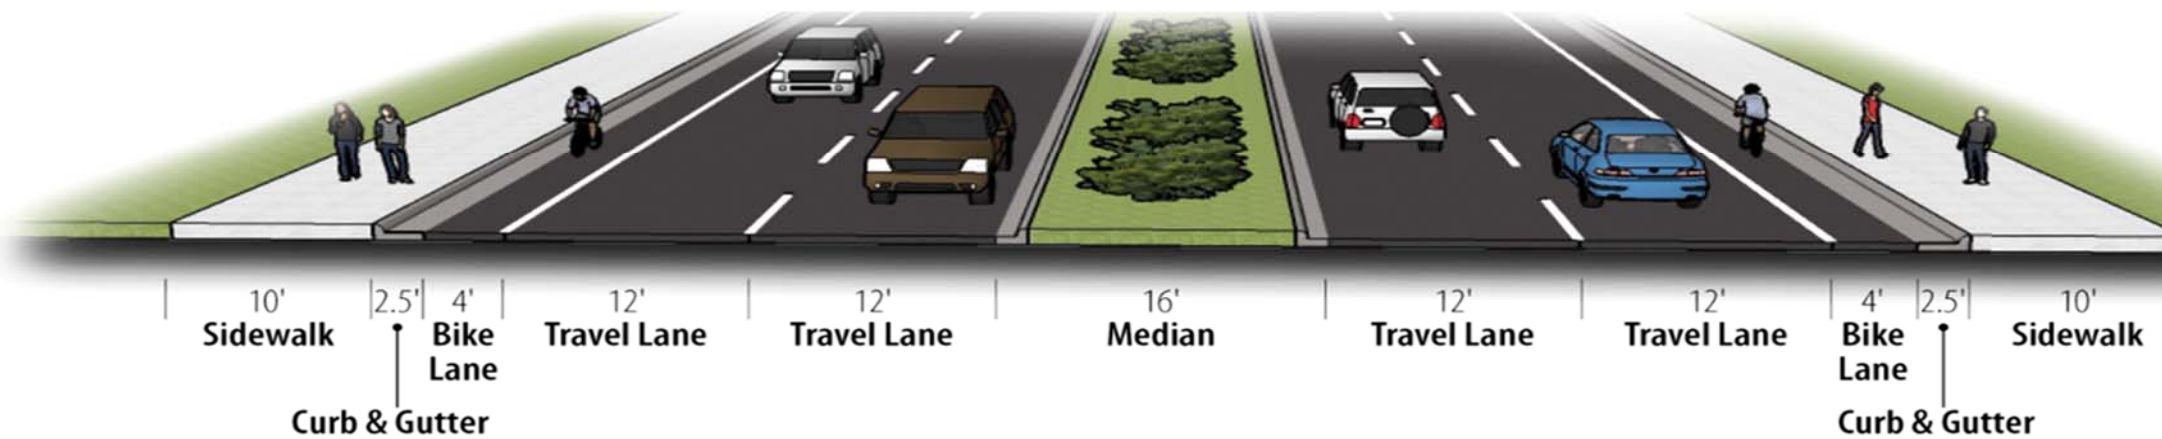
Recommended Cross-Section (east of Toms Creek Road)
